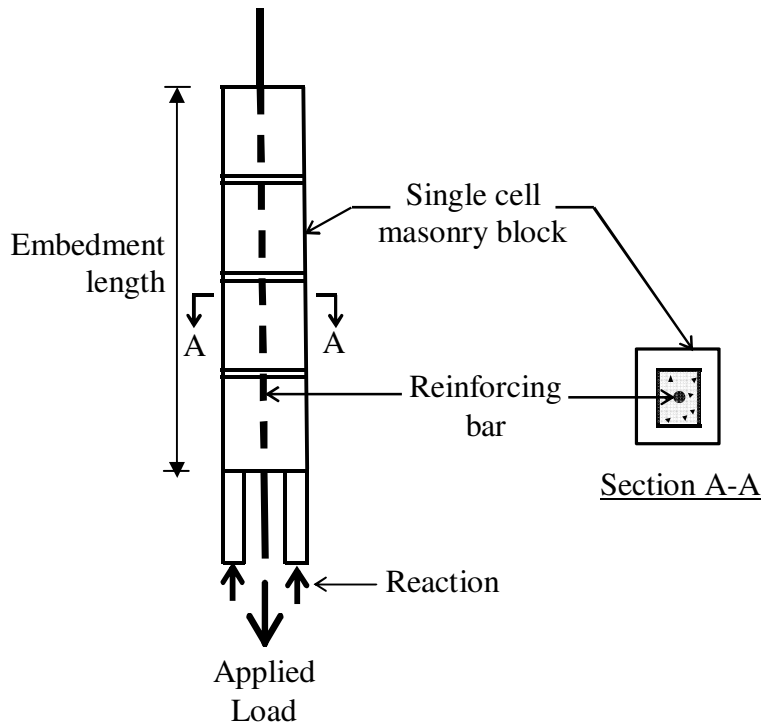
Stack bonded single-cell pullout specimen: (a) cross section, and (b) loading arrangement (modified from Soric & Tulin, 1989).
